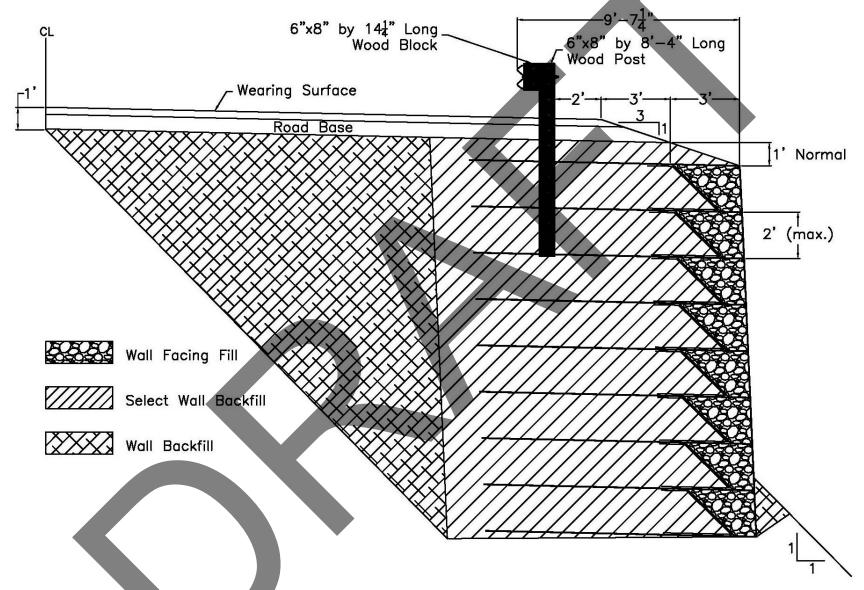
Schematic. Baseline Configuration for W-Beam Guardrail and MSE Wall.
